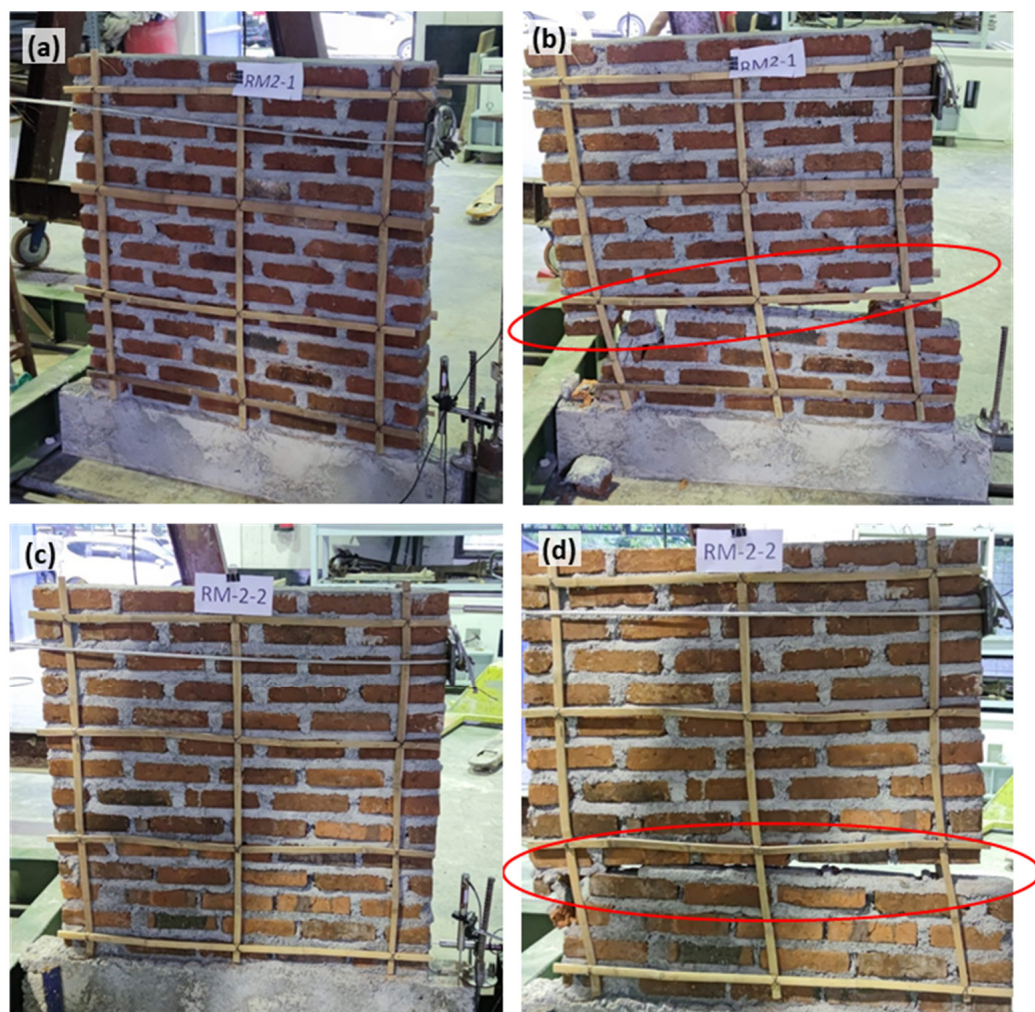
The pushover shear test and crack patterns of the retrofitted masonry panels with 1.44% of bamboo retrofitting: (a,b) RM2-1, and (c,d) RM2-2.
